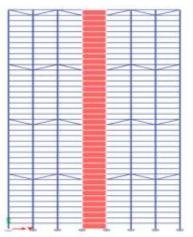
Sectional view for 40 Storey with core wall and outrigger at 0.5H+0.25H+0.75H+H.
